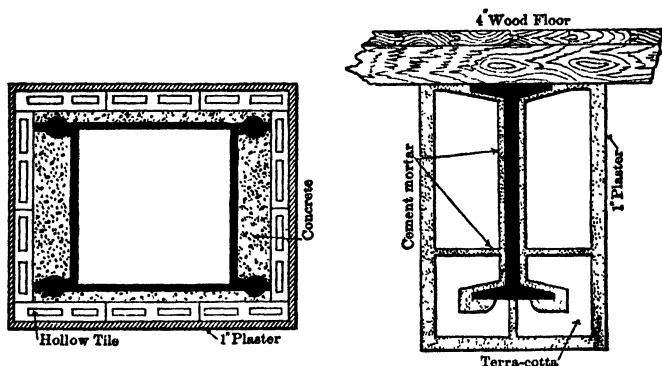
Fireproofing of Steel Columns and Beam with Tile
